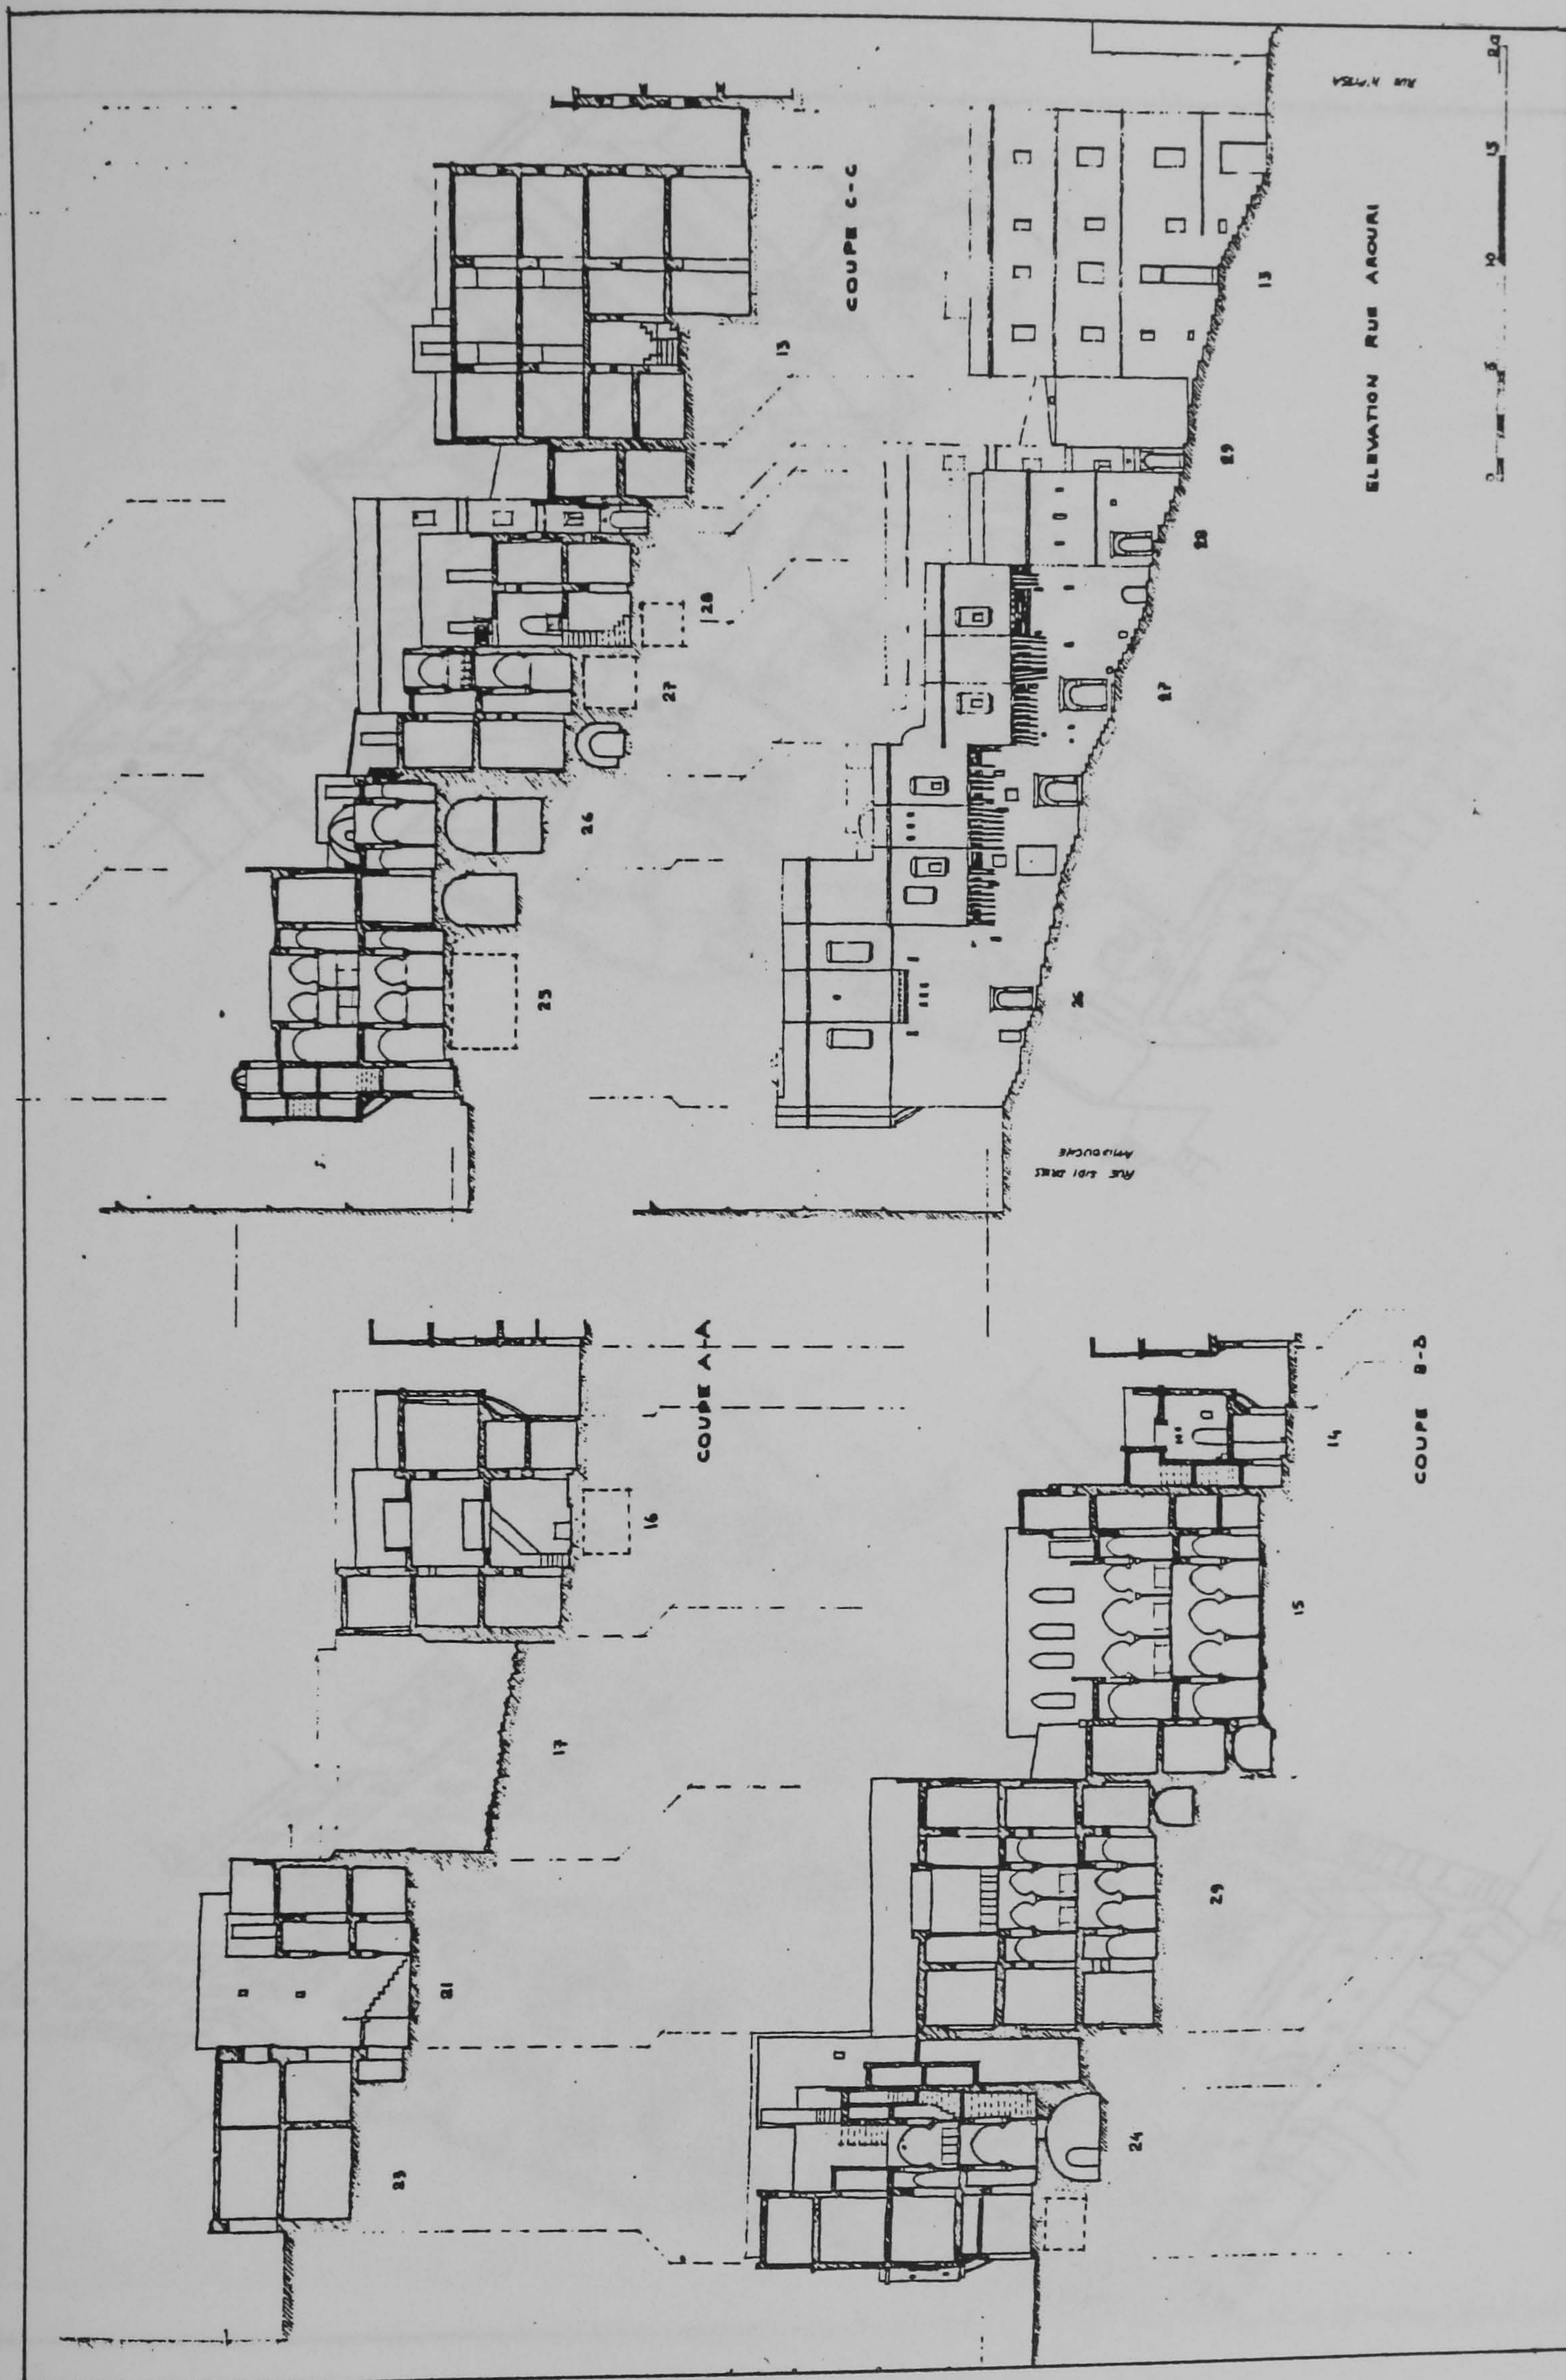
Sections and Elevation of a Cluster Housing in the Casbah
